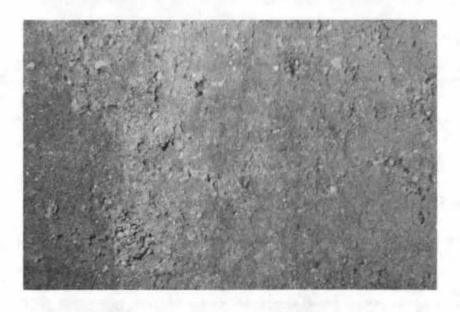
Close-up view, 1% lignosulfonate additive section, 2 weeks after construction, 1970, Clinton test road.
